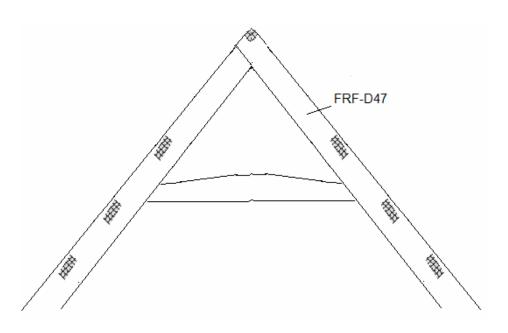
Connecting range; sketch of truss 11, showing the location of sample FRF-D47
